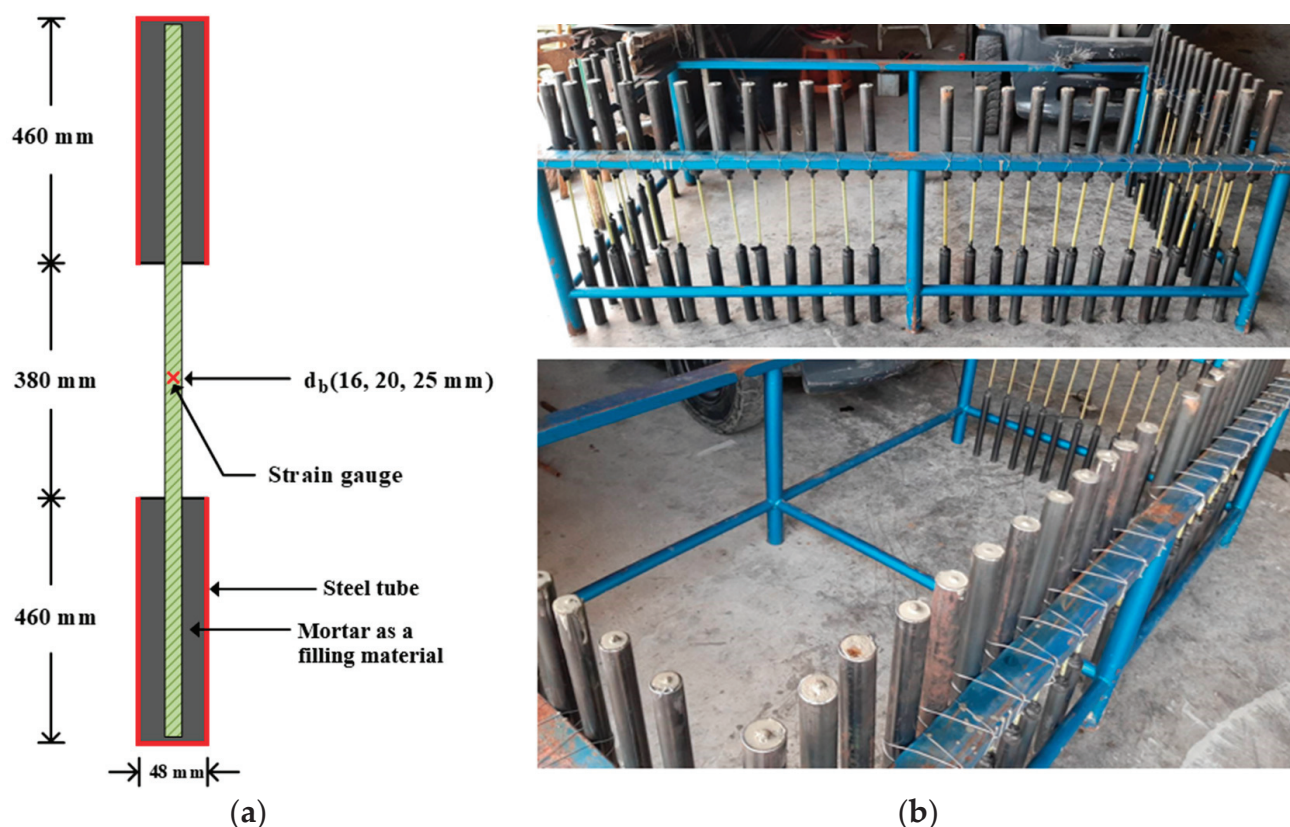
Test specimens: (a) details of a specimen (ASTM D7205/D7205M-06 [27]); (b) illustration of specimens and anchorages.
